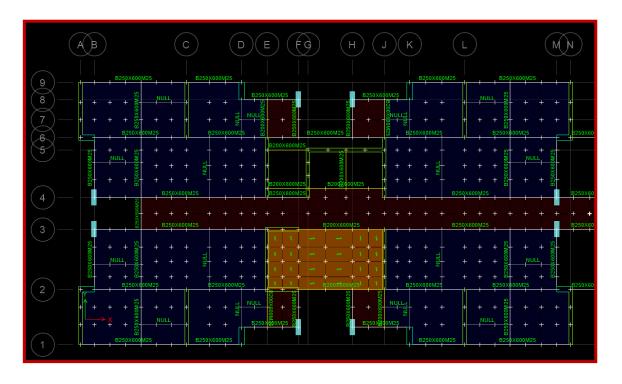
B Structural Typical Floor Plan of Left Part of G+12 Storied Building DESCRIPTION OF STRUCTURAL WALLS:
